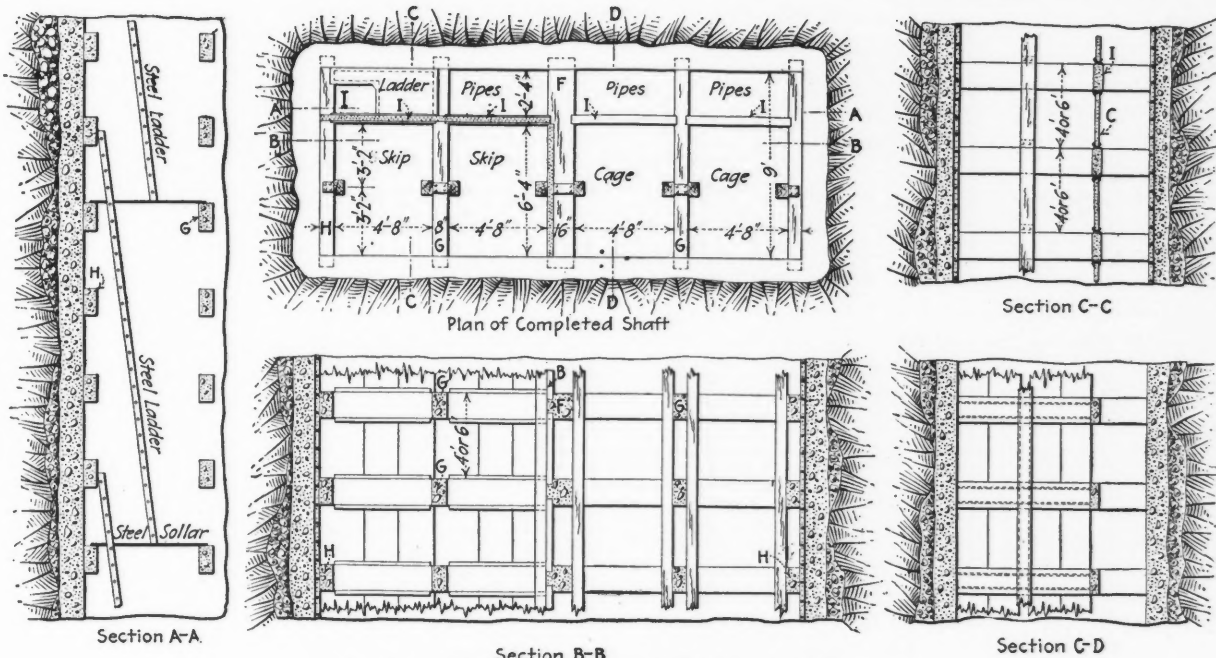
ARRANGEMENT OF CONCRETE LINING
